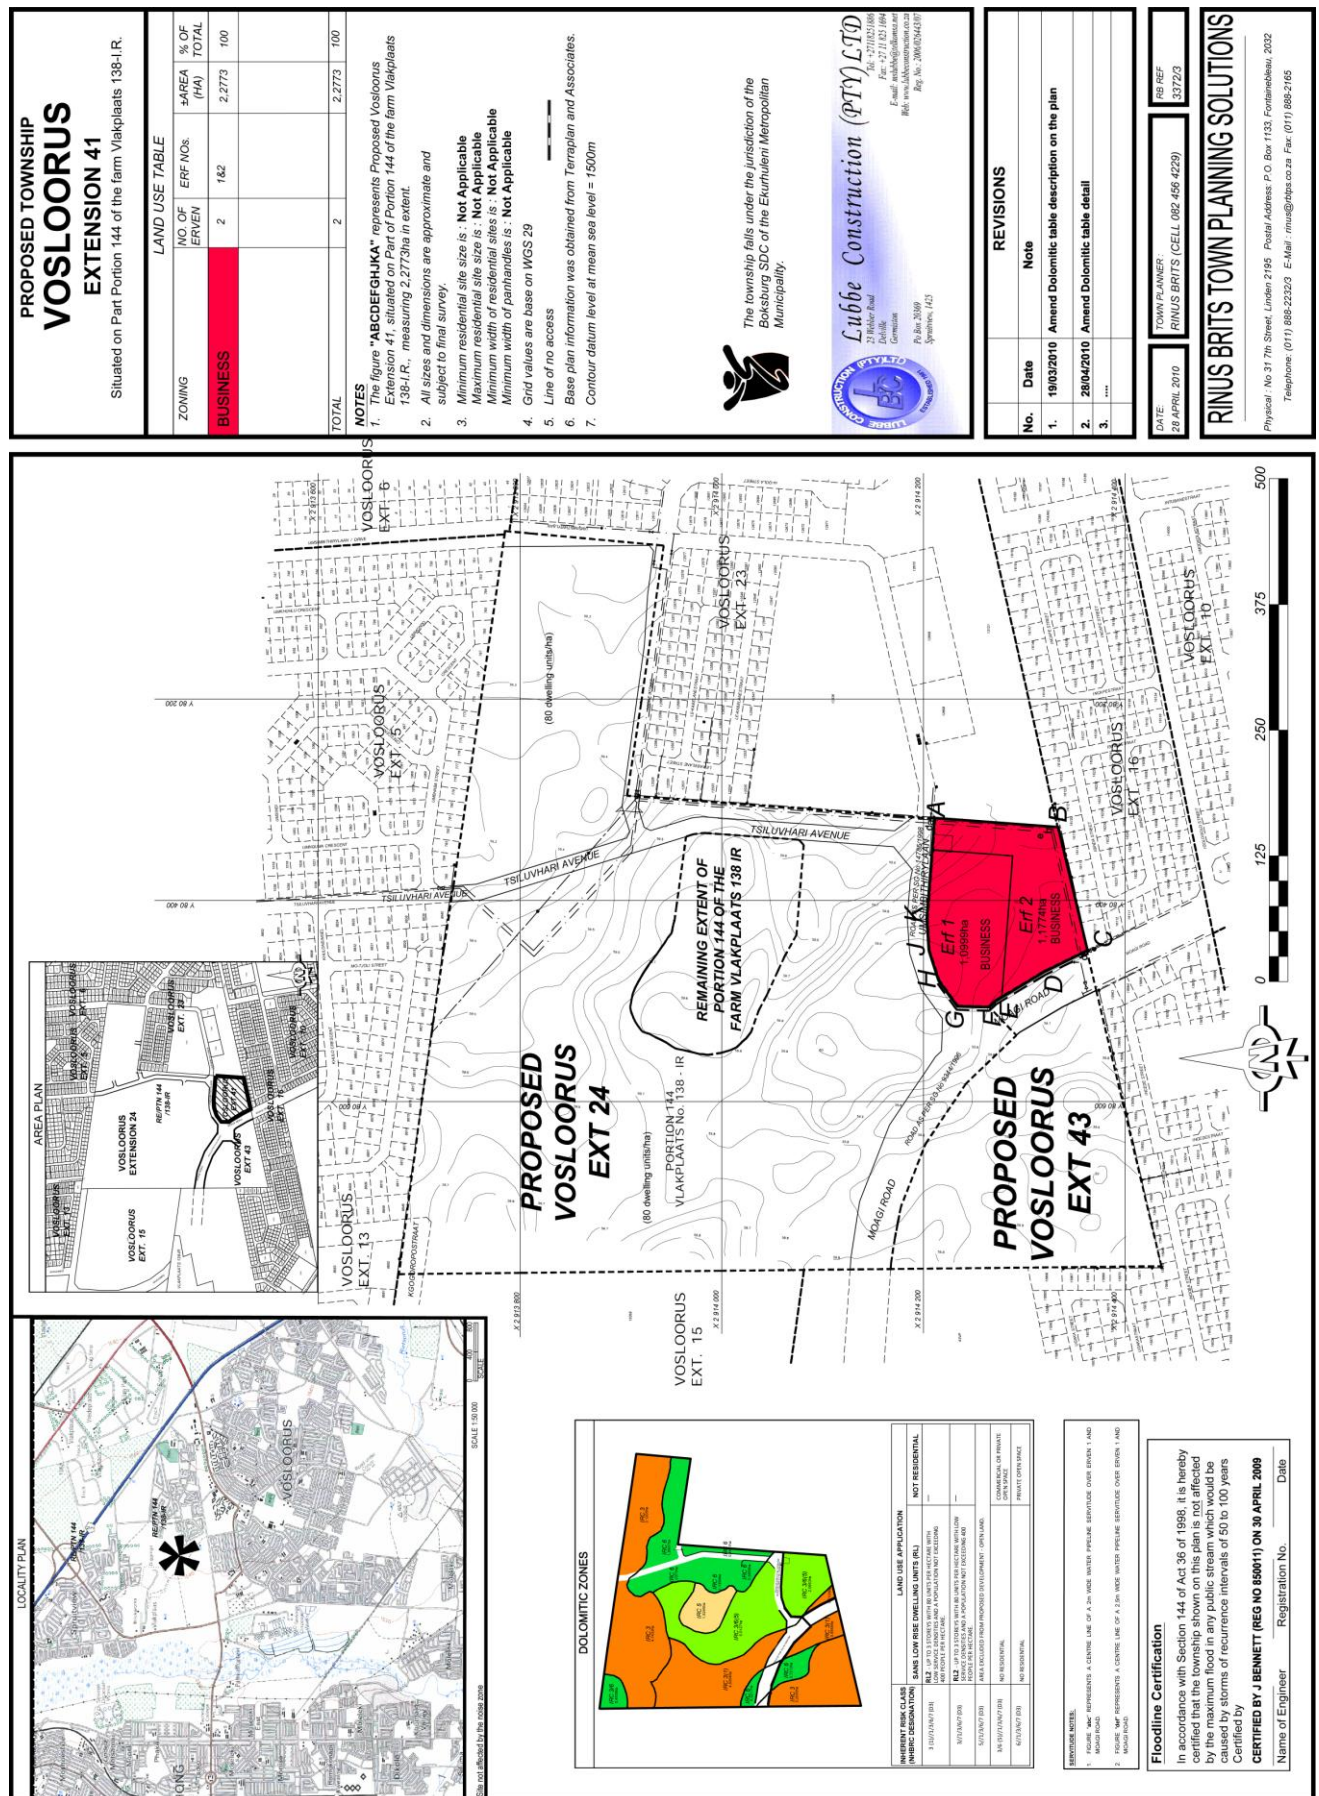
Development layout plan for Vosloorus Extension 41. The plan was supplied by Enkanyini Projects.
